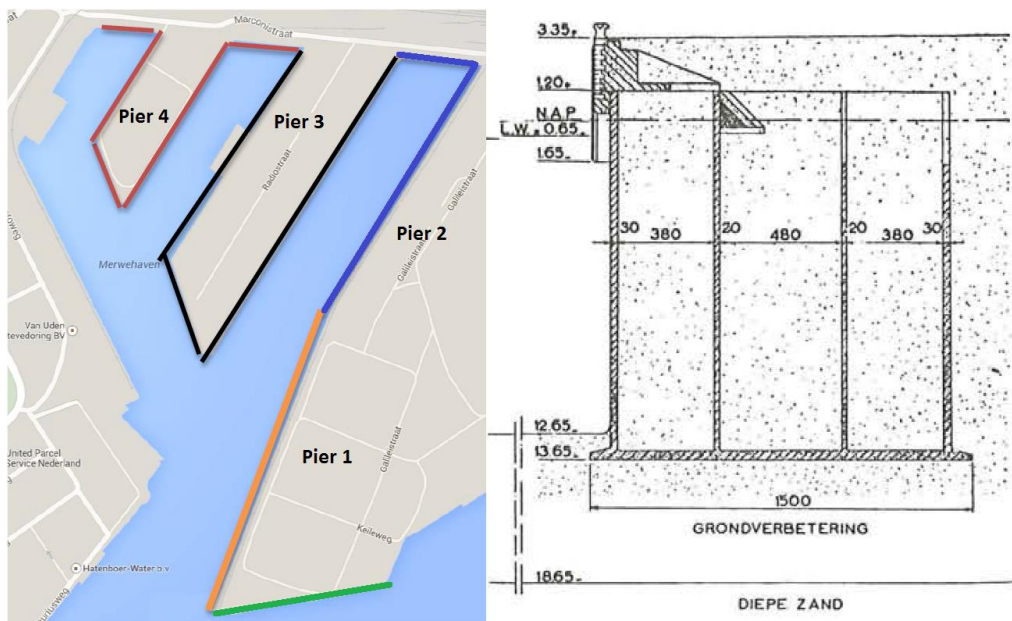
Top view of the Merwehaven (Google Maps) and a cross-section of the caisson used as quay wall in the Merwehaven (HBG, 1977)
